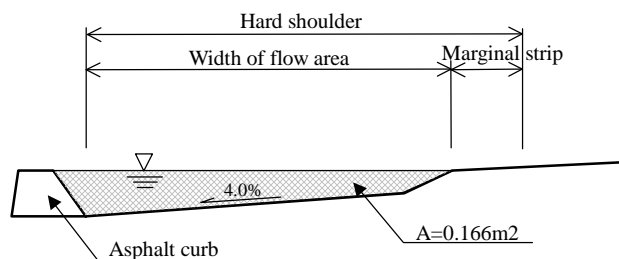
Section of OCH Road Drainage Facility (Asphalt Concrete Curb)
